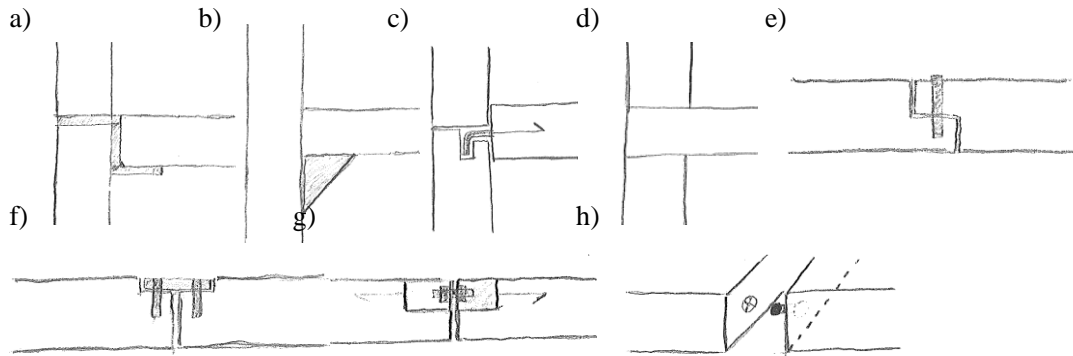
Connection concepts invented in the brainstorming phase and that are not rejected in the first elimination. a) z-profile b) Cantilever support c) Hook d) Floor element between wall elements e) Bolted elements f) Bolted steel plate g) Screwed steel plates h) Click connection
